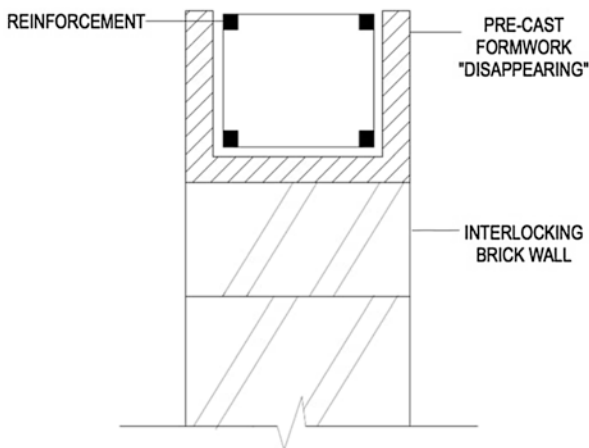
Cross section of a wall to illustrate use of appropriate disappearing beam formwork. (Source: Moses 2015)
